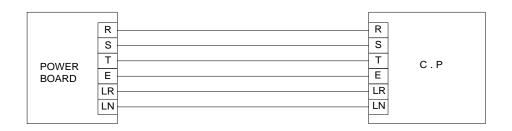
MACHINE ROOM WIRING LAYOUT
